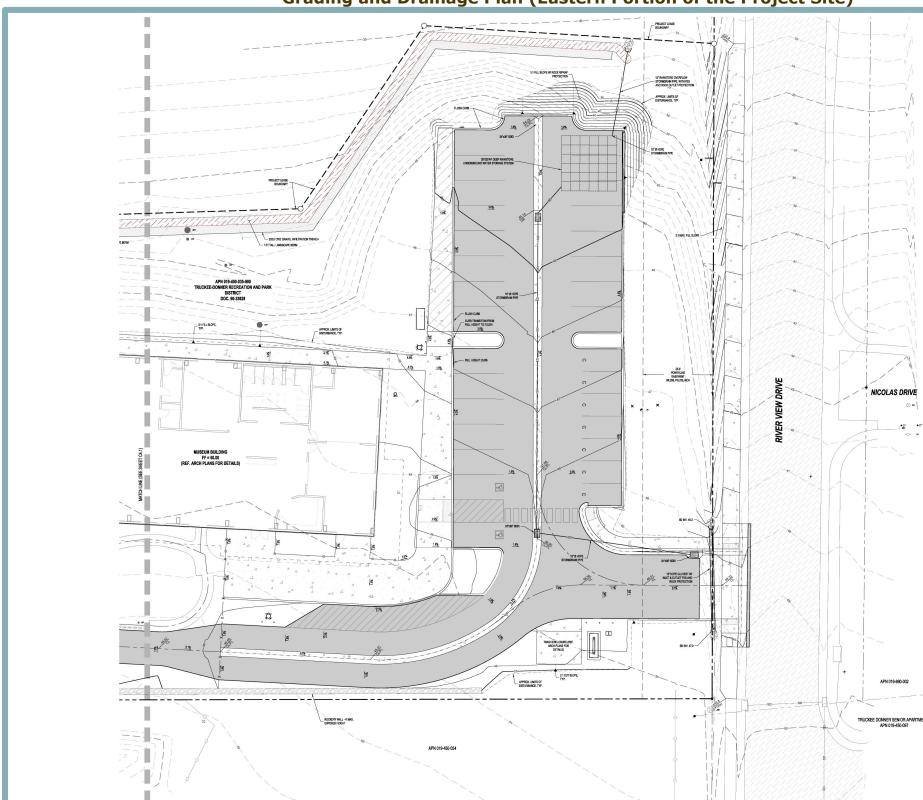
Grading and Drainage Plan (Eastern Portion of the Project Site)
